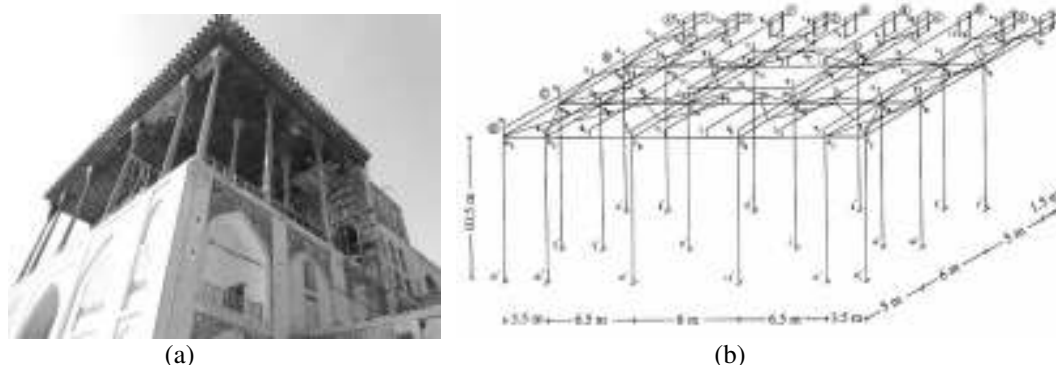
Ali Qapu building, Isfahan, 1597-1668 A.D.: (a) wooden structure on the masonry building, (b) structural members (columns, main and secondary beam, trusses and horizontal lateral bracing) of the wooden structure
